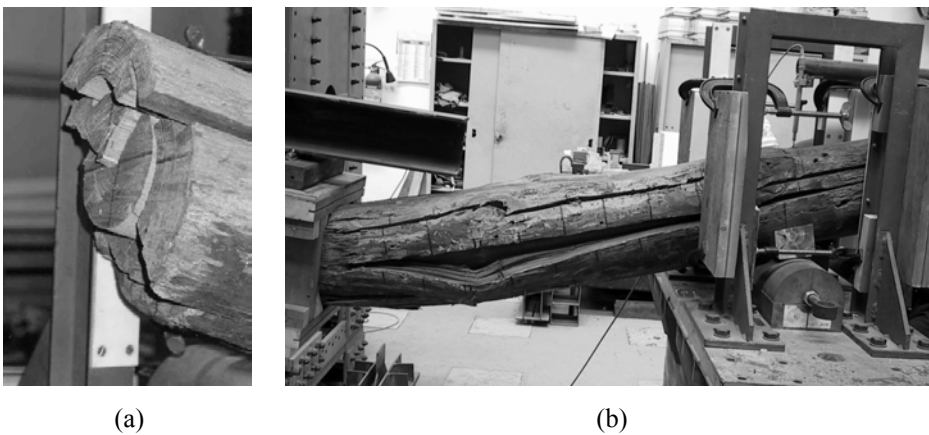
Slipping at the end-beam with small cross-section dimension of Beam 2 (a); failure-type collapse mode of Beam 2 (b).
